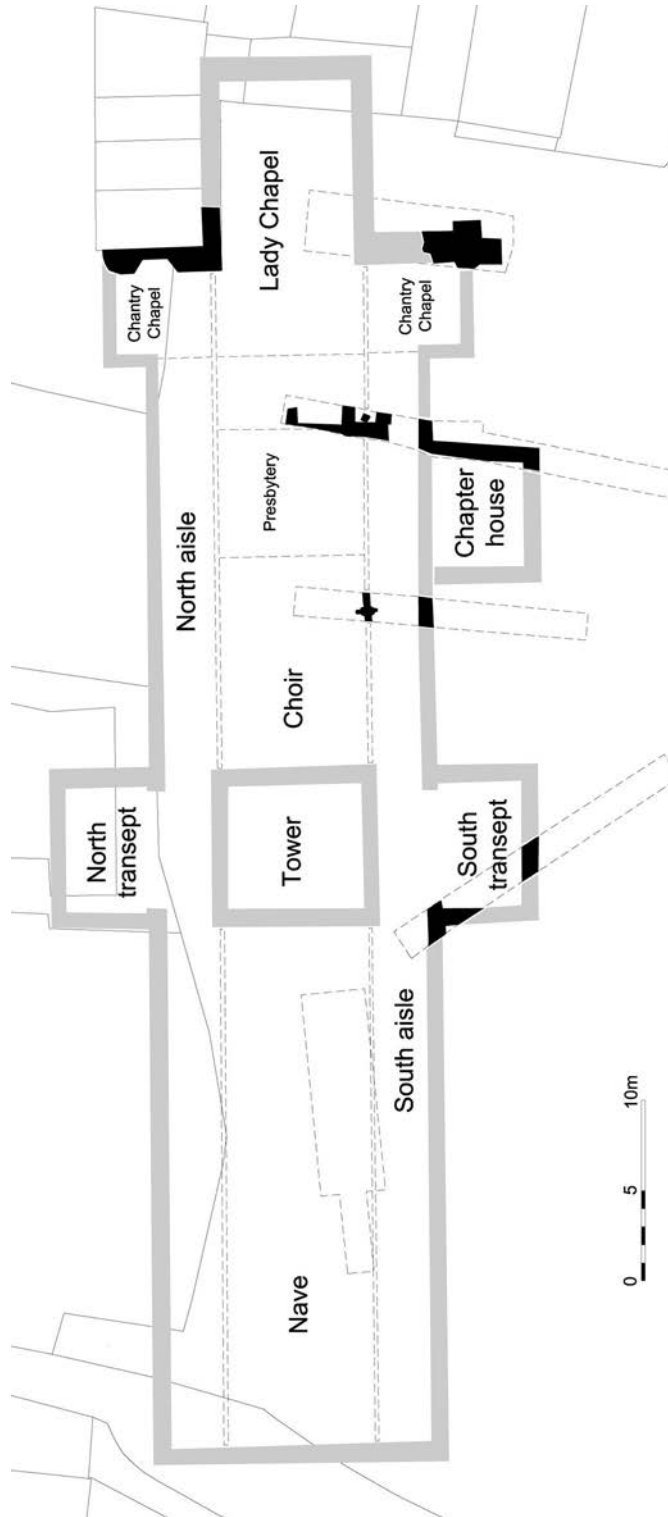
Reconstruction plan of the church. (© Cornwall Archaeological Unit.)
